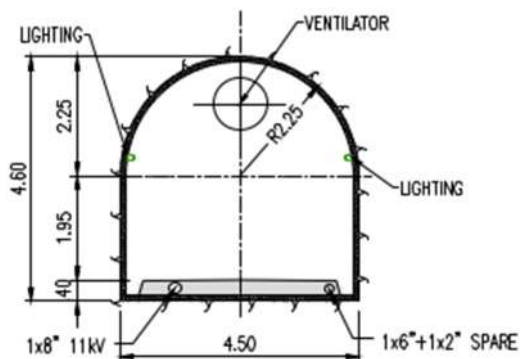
Emergency and Ventilation Tunnel – typical section
